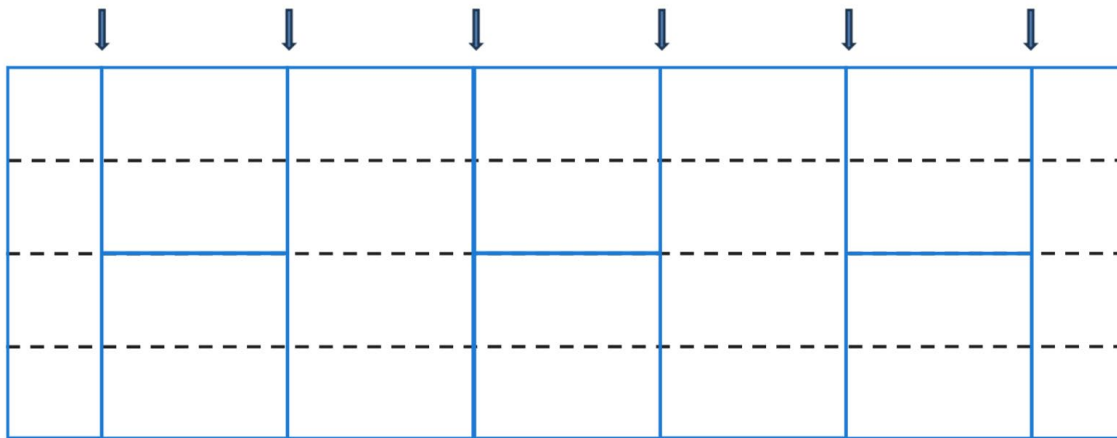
SIMPLE BEAM DIAPHRAGM CONFIGURATION FOR LOAD APPLIED PERPENDICULAR TO JOISTS
